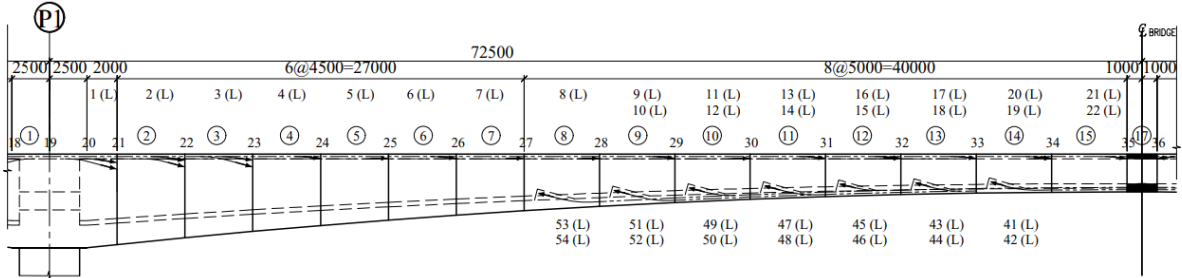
Longitudinal Section of the Bridge with Prestressed Tendon Configuration.
